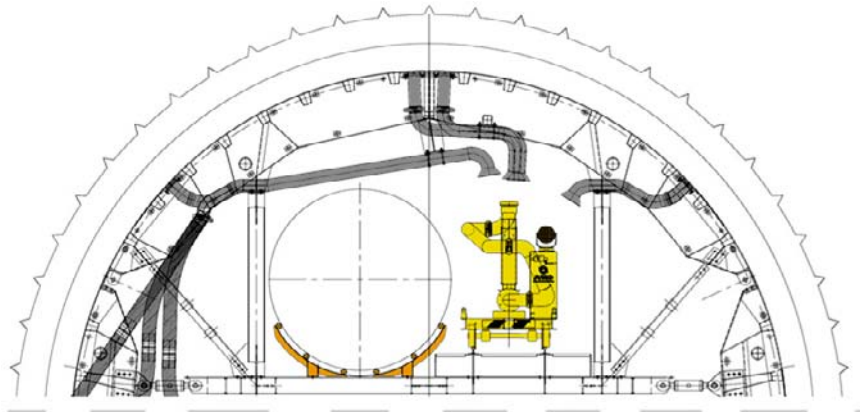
DCL Concrete distributor pipes approaching and ventilation pipe support
